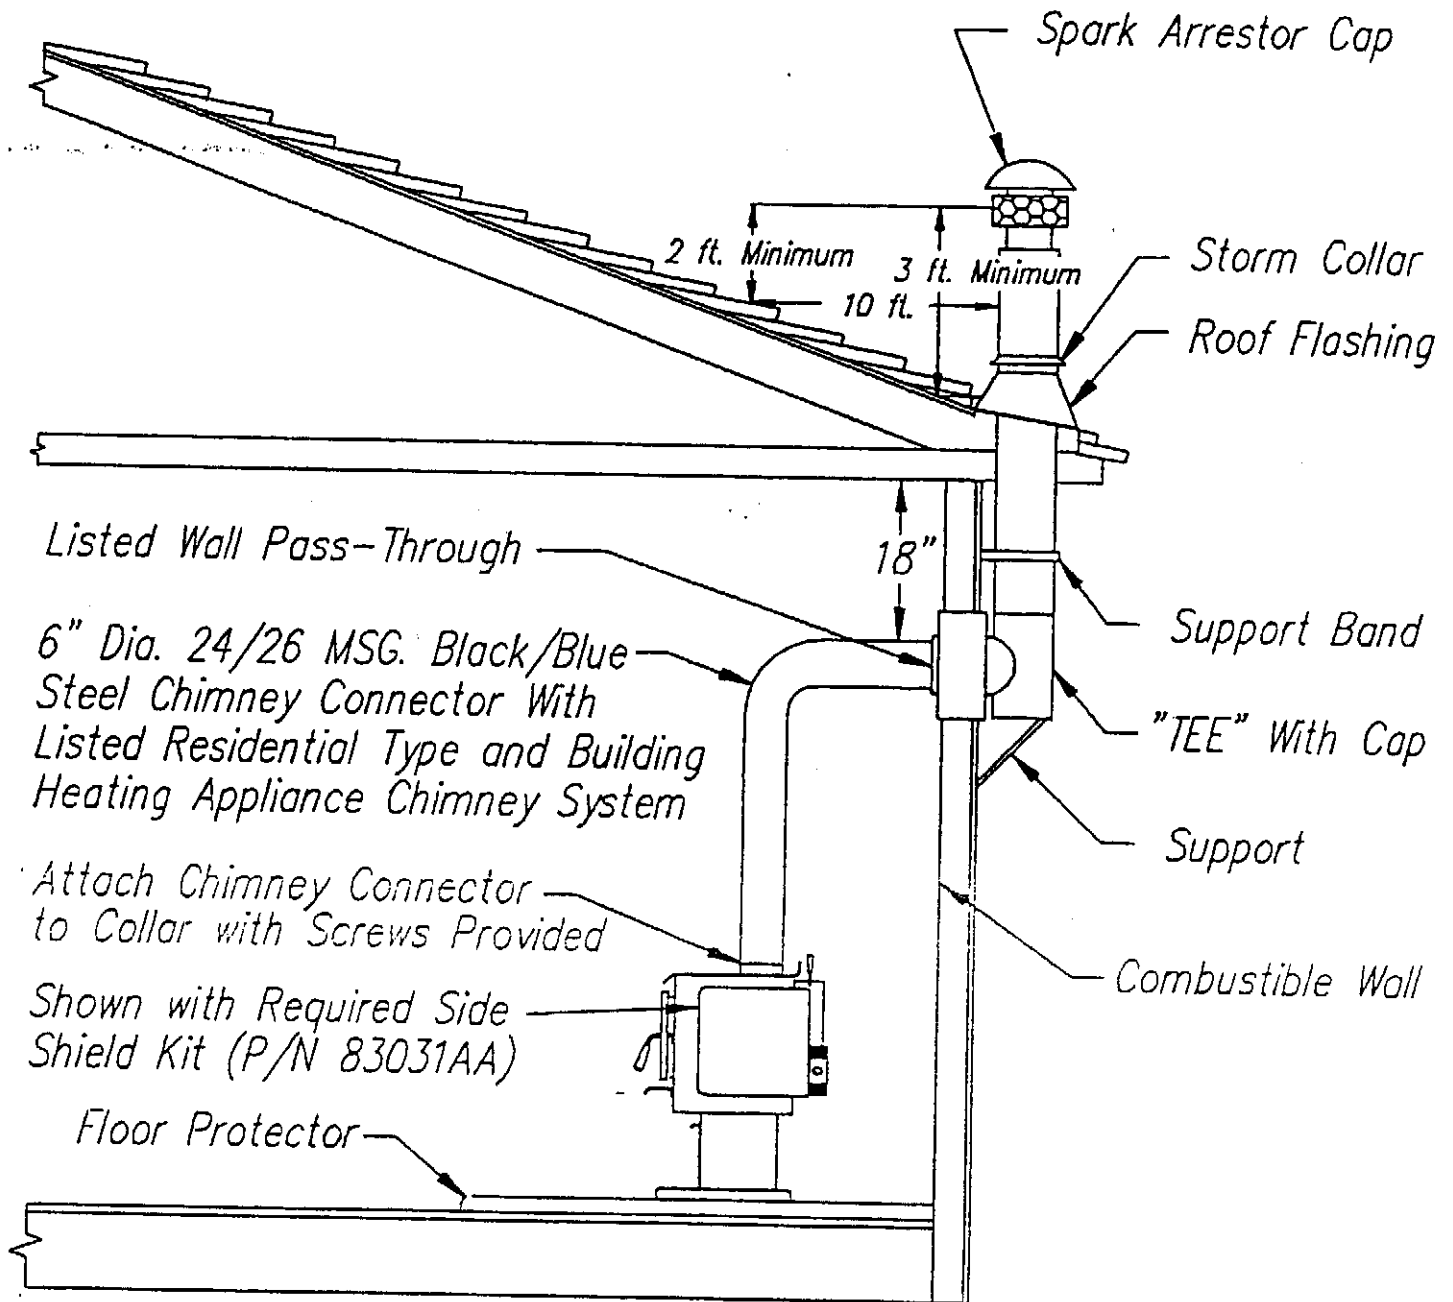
Residential Installation Using Listed Prefabricated Chimney System.
